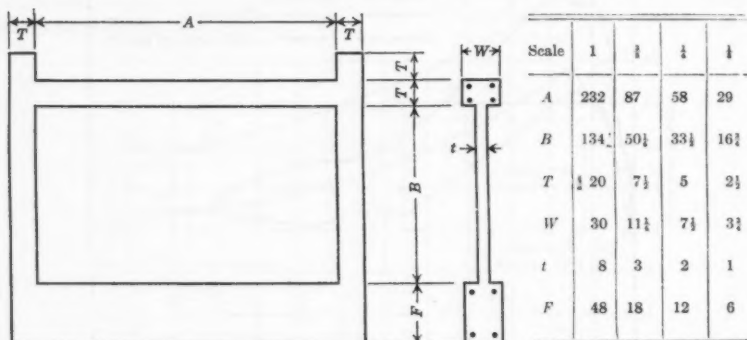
SCALE-EFFECT MODELS. REINFORCING USED IN SPECIMENS WITH REINFORCED PANELS-0.5%
